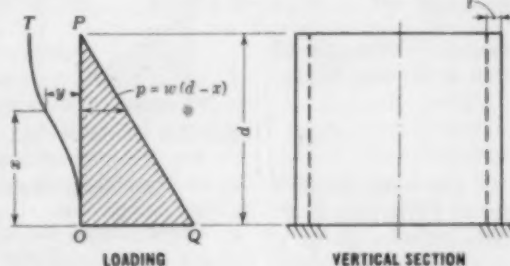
LOAD DIAGRAM AND DEFLECTION CURVE FOR THE WALL OF A CYLINDRICAL CONCRETE TANK WITH A FIXED BASE
